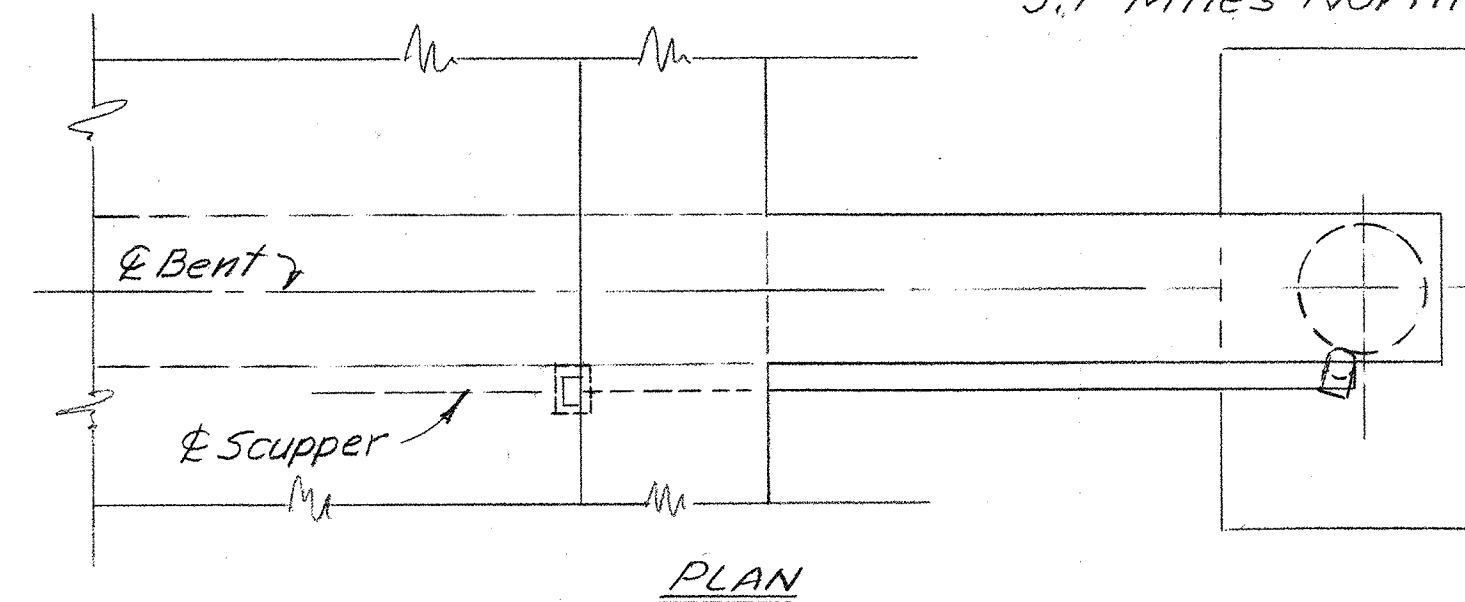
DETAIL - EXPANSION JOINT STRENGTHENING & REPAIRS - NORTH BOUND
